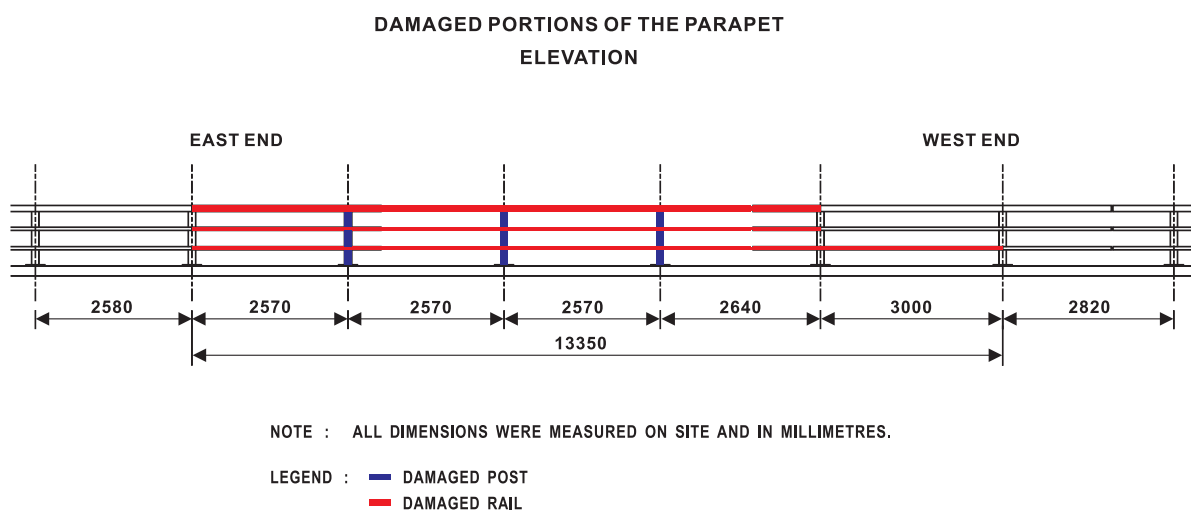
Elevation of the parapet showing damaged portions
